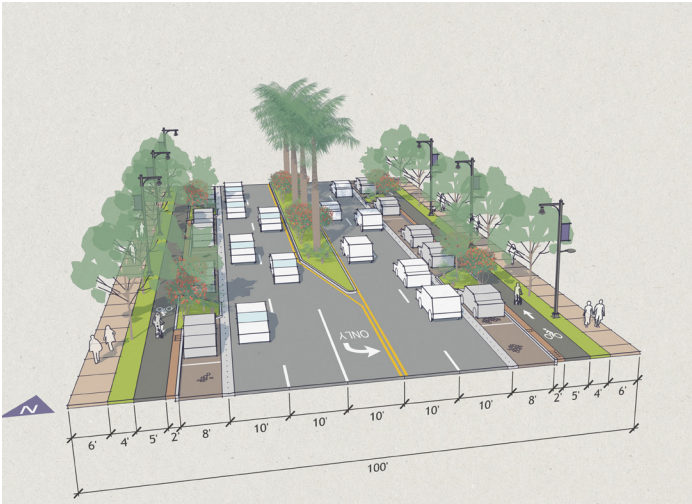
Proposed street section for Fair Oaks Avenue North of 110
